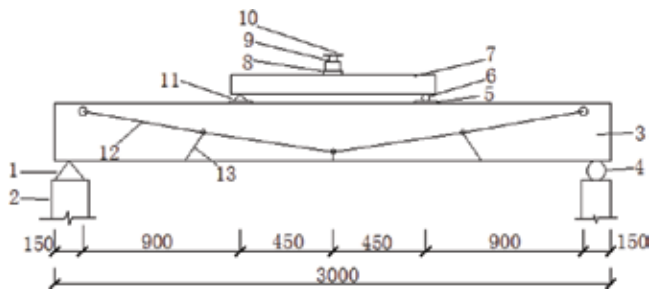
Schematic diagram for loading setup (the unit used in the figure is mm). Notes: (1) fixed hinged support; (2) buttress; (3) test beams; (4) rolling hinged support; (5) backing plate; (6) rolling hinged support; (7) distributive girder; (8) jack; (9) pressure sensor; (10) reaction beam; (11) rolling hinged support; (12) wire rope; and (13) web member.
